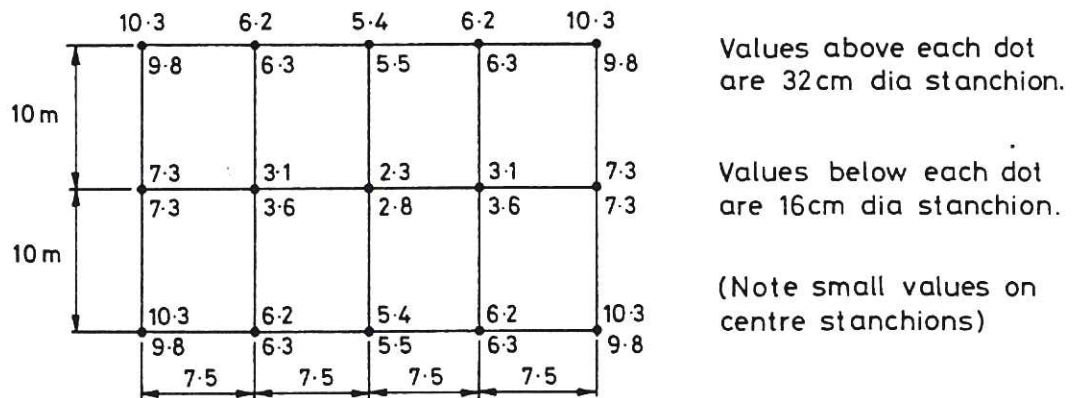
Plan view of current distribution 15 stanchion building (INDCAL).
